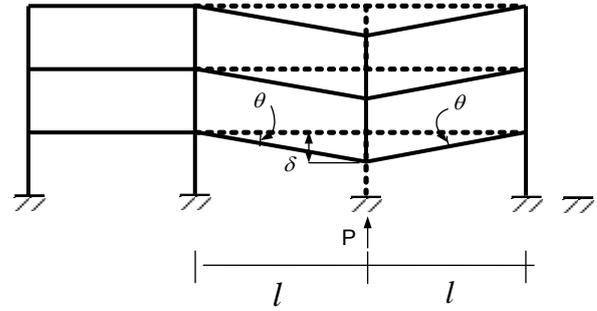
Beam rotation and joint deflection caused by loss of a column
